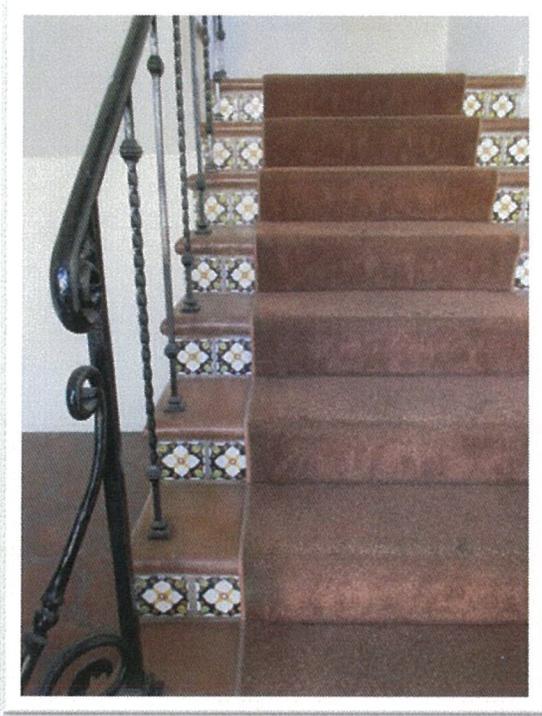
East wing (9379) lobby stair and typical apartment entry detail
